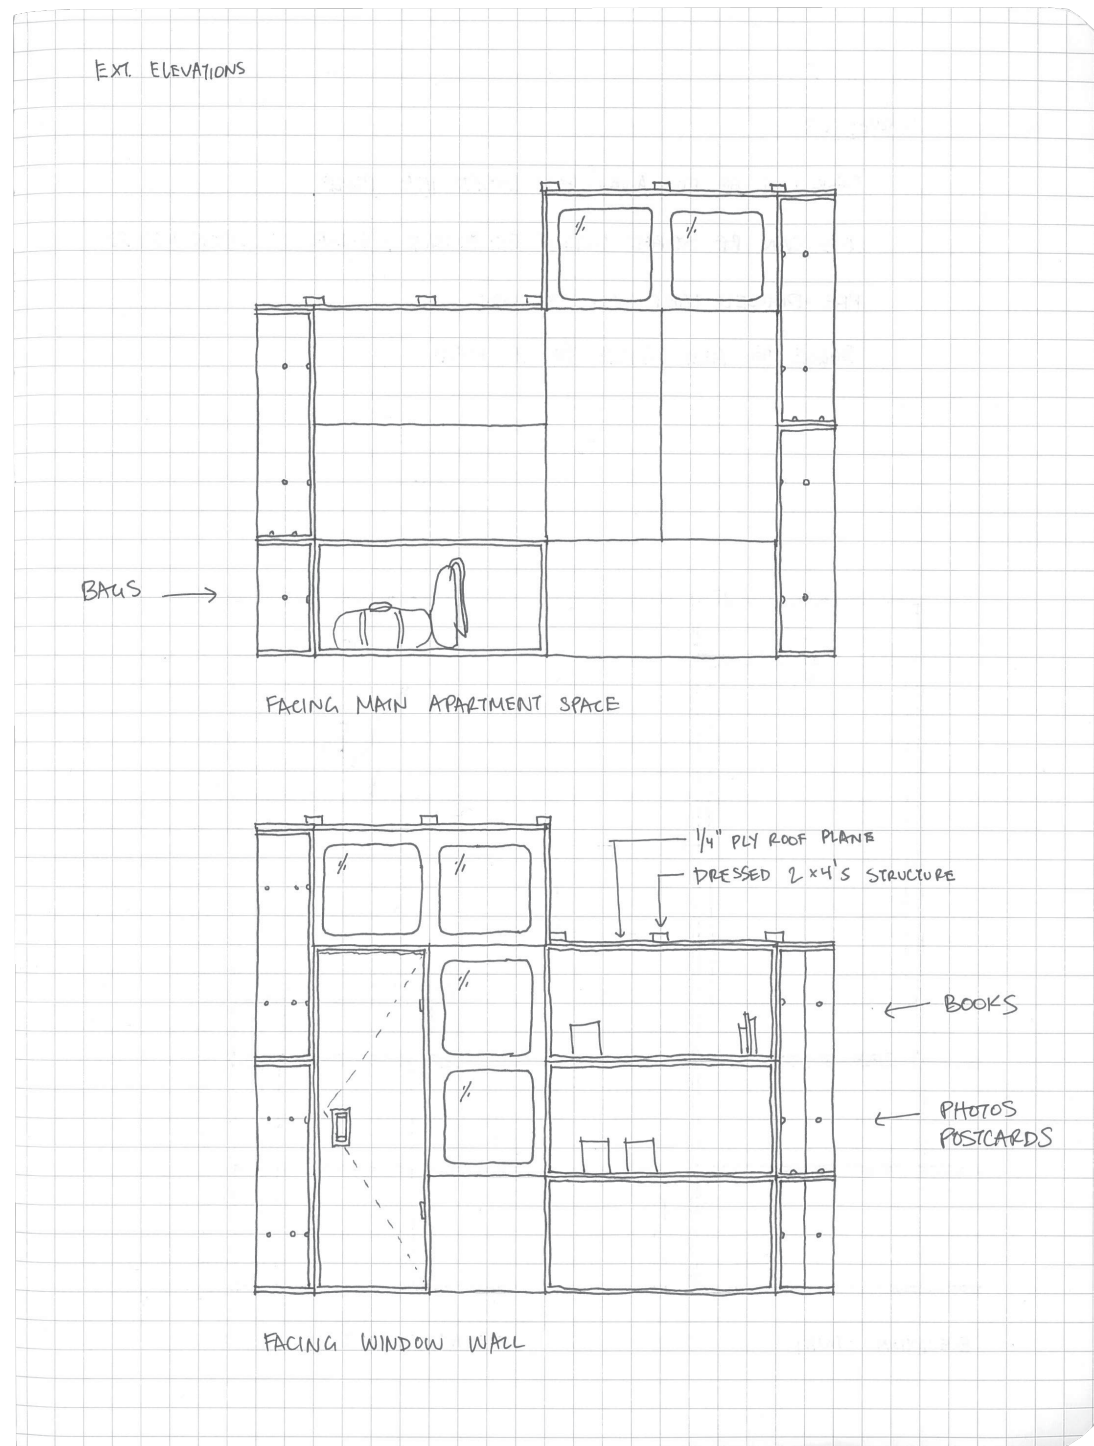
Process | Notebook: Interior Elevations 2 (opposite)
